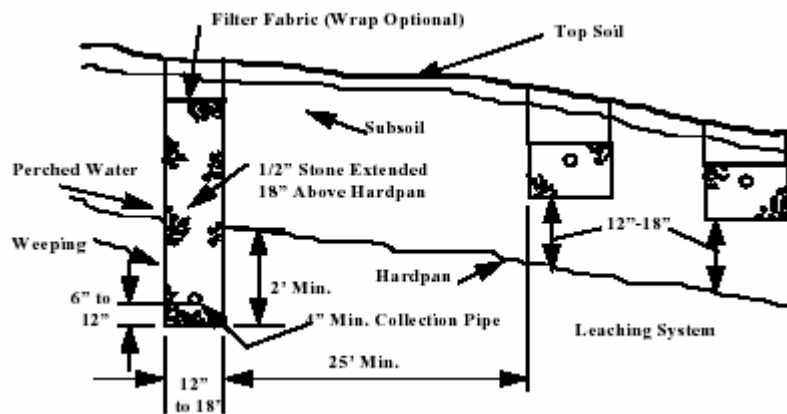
TYPICAL CURTAIN DRAIN CONSTRUCTION
